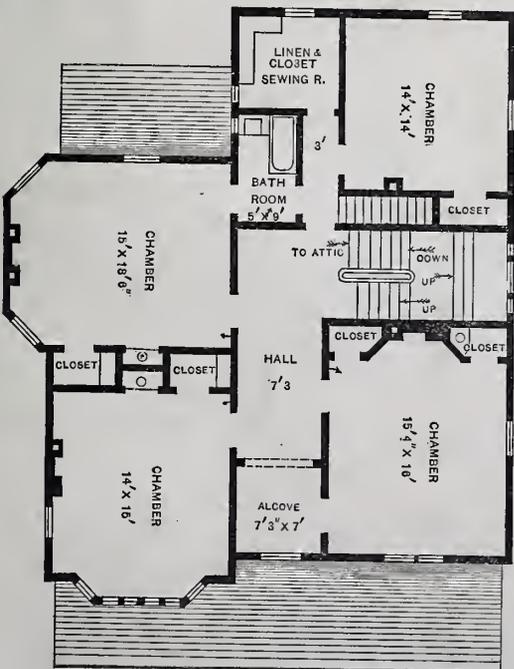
Second Floor Plan.—Scale, 1-16 Inch to the Foot.
